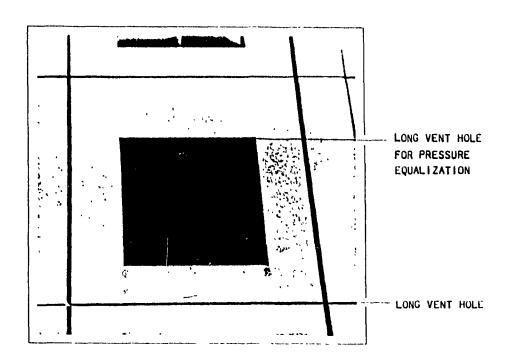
Precast concrete panels of Place Air Canada; each panel consists of one compartment
